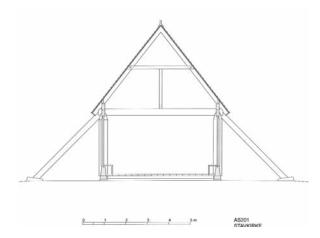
Trondenes Almenningr, stave church reconstruction of 2016, cross section (drawing Gisle Jakhelln)
